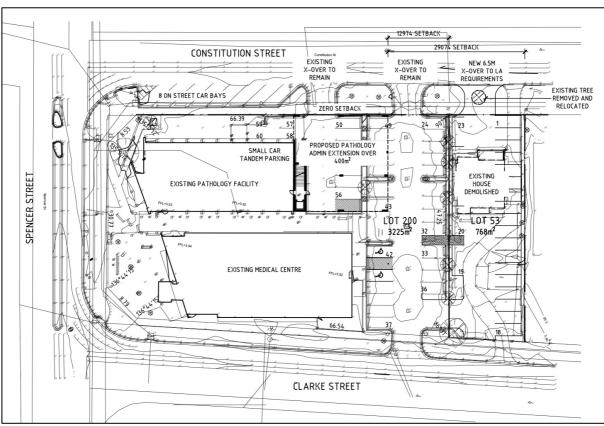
Indicative Site Concept Plan (refer to DA for detail)
